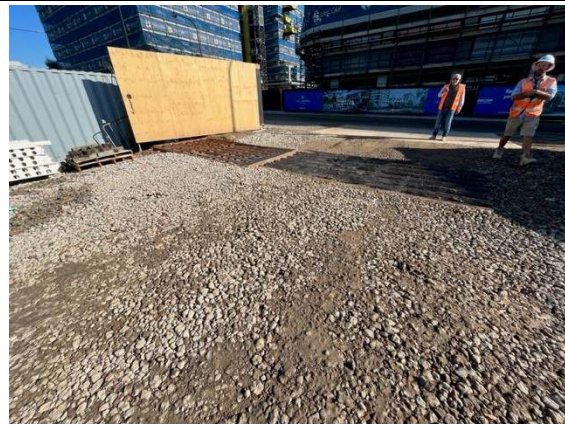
Site 1 – First flush system for the reuse of greywater in the future retail space
